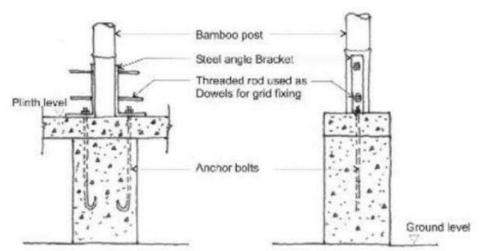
58Fixing detail of bamboo to plinth using bolted connection.
